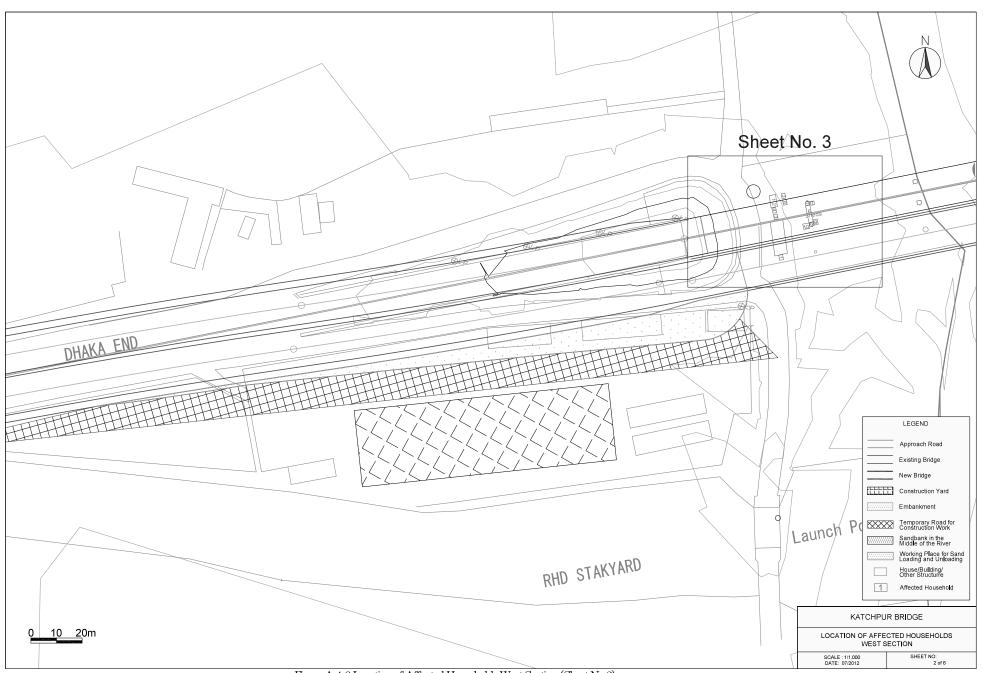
Location of Affected Households West Section (Sheet No.2)
